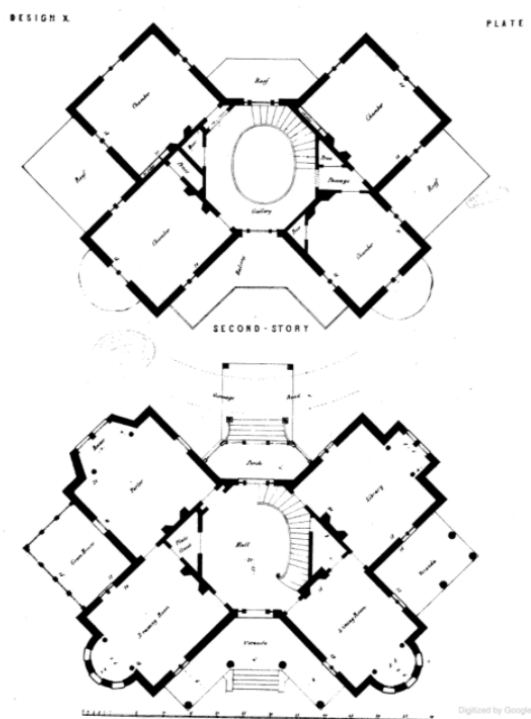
Plan and rendering from The Architect by William H. Ranlett. Pates 31, 32. 1849.
